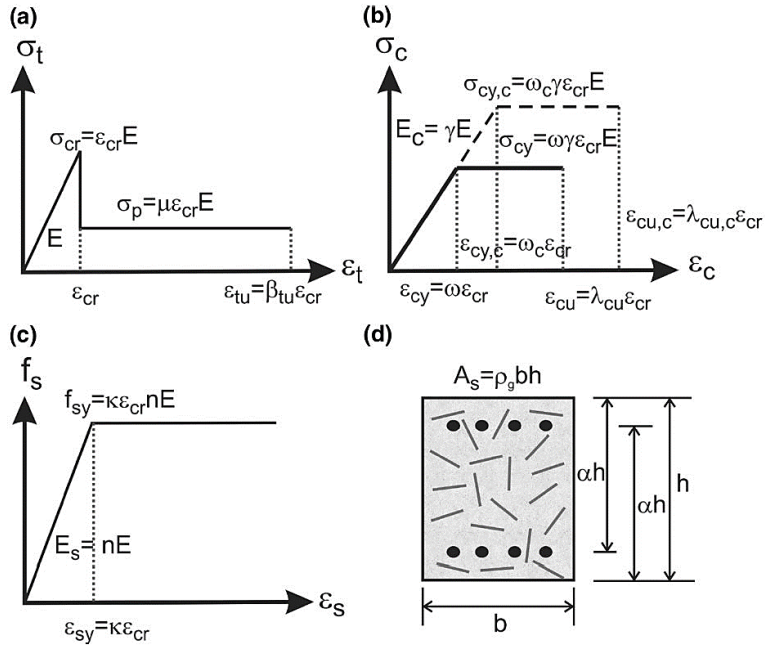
Material model for double reinforced concrete design (a) tension model; (b) compression model; (c) steel model; (d) beam cross section.
